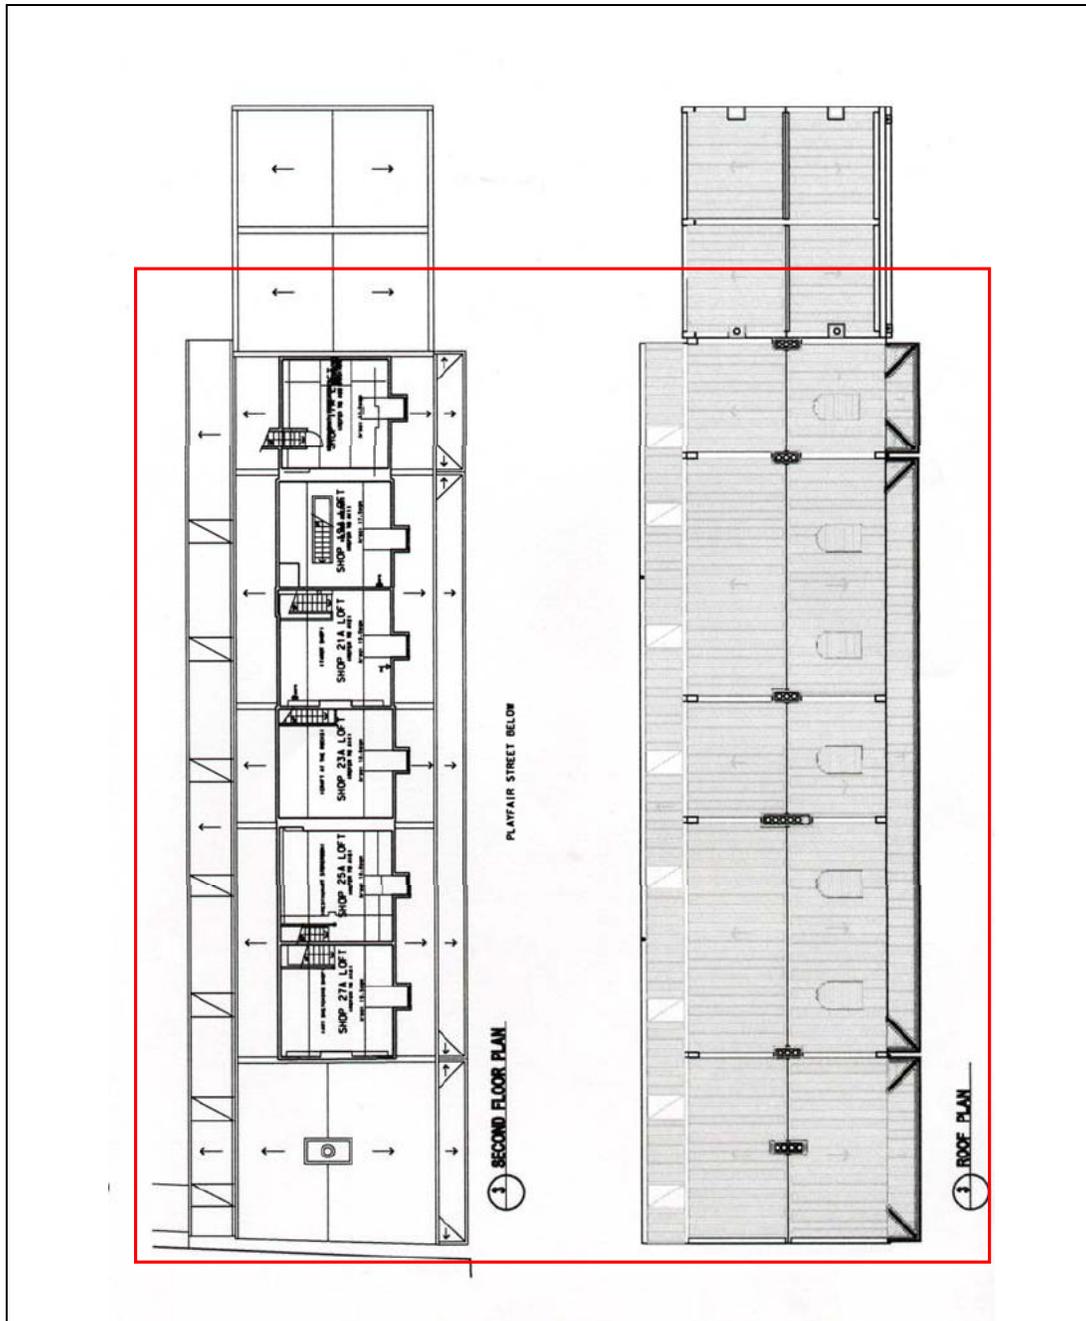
Attic and Roof Plans (Source: Foreshore Authority, July 2003).
